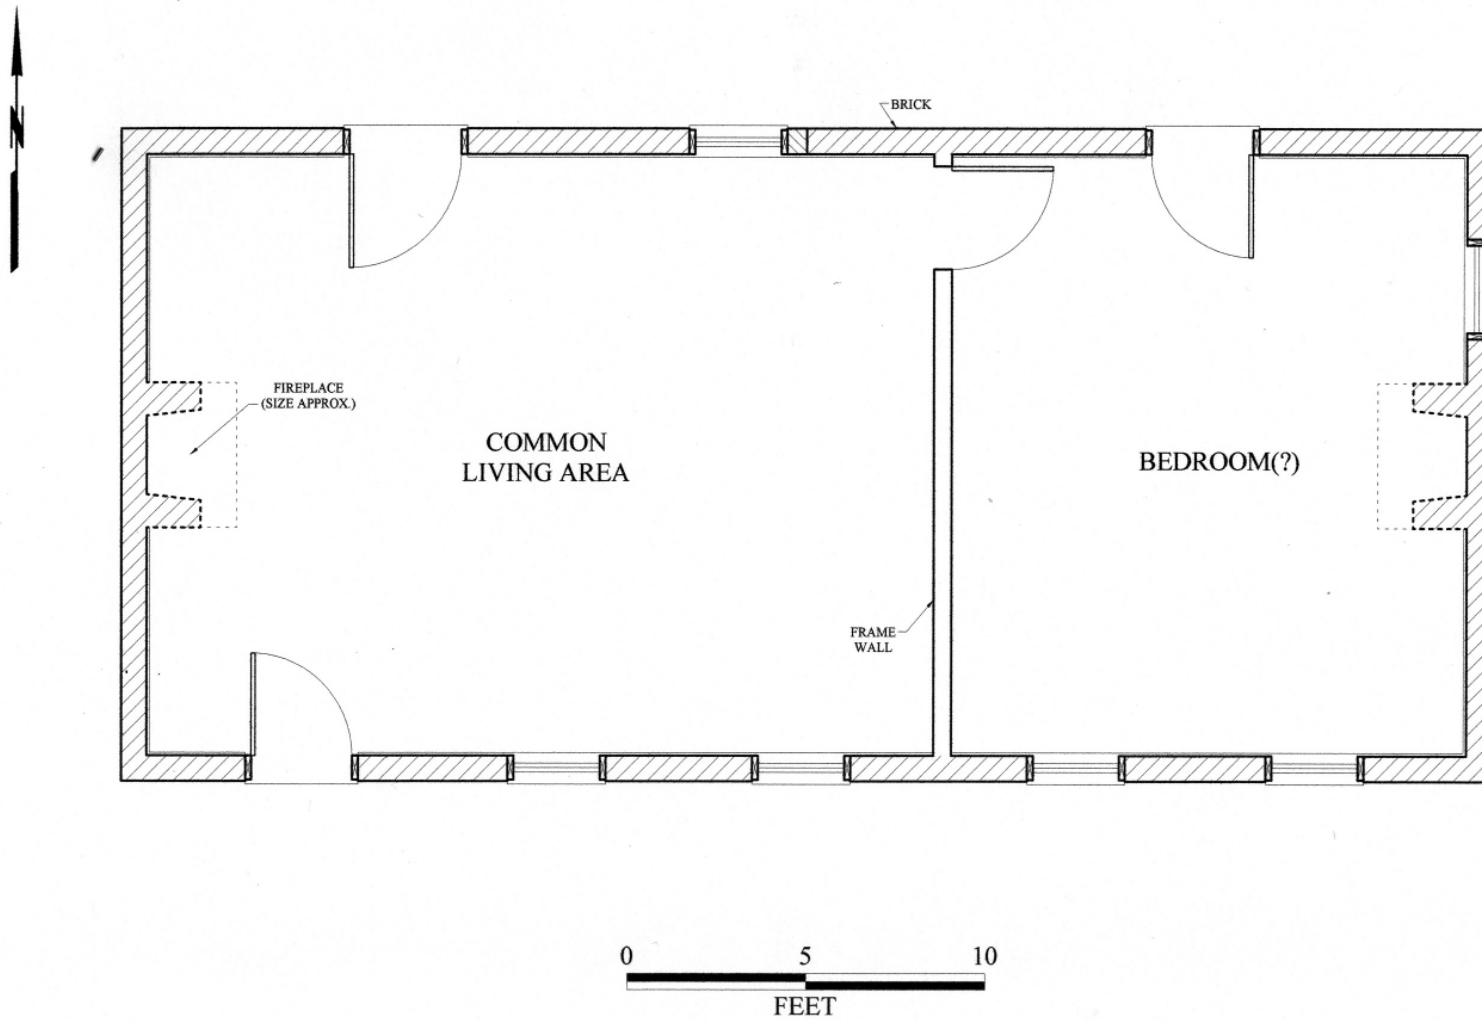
Conjectural floor plan of the original house constructed at the Roman-Seibert Site in the early 1830s.
